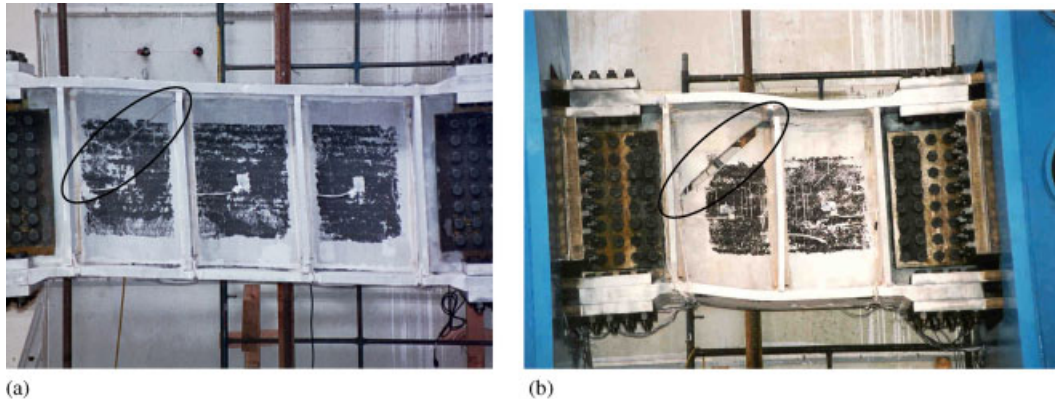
Brittle fracture of link specimens: (a) type 1 specimen; and (b) type 3 specimen.
